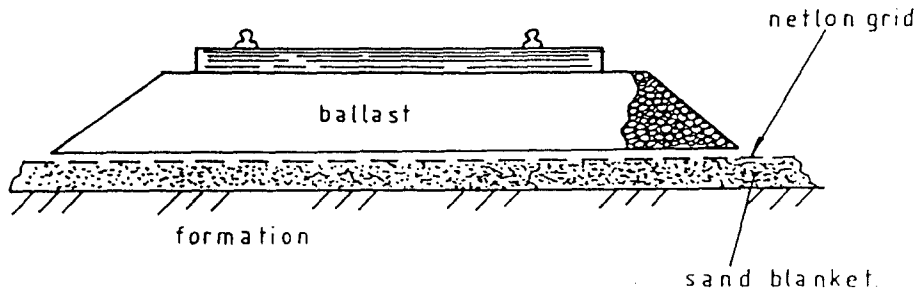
The use of reinforcement in conjunction with a shallow sand blanket.
